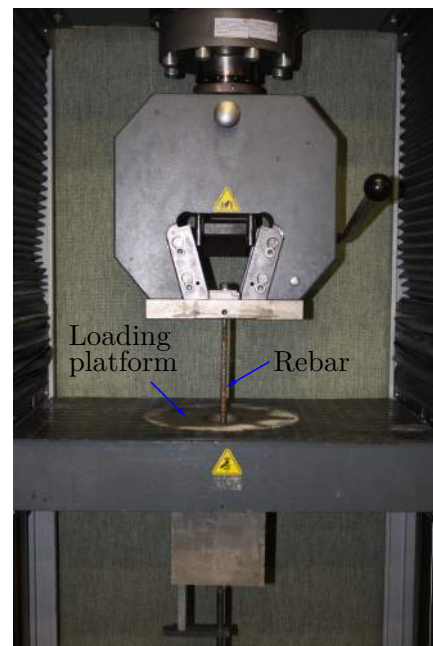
Another view of the PO test setup which shows the bar passing through the loading platform and fixed to the machine frame.
